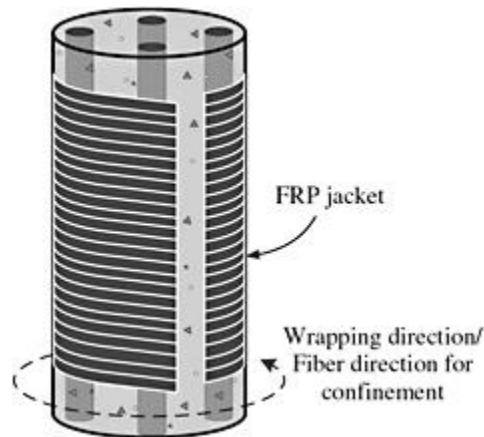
Schematic of an FRP wrapped column showing fibre orientation (Source: Master Builders, Inc. and Structural Preservation Systems, 1998).
